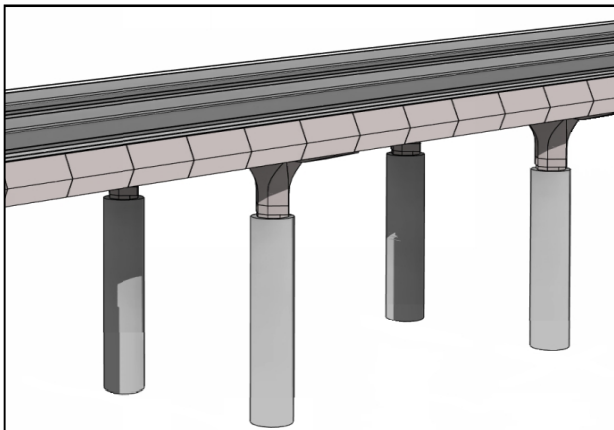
Simply supported, mono-pile bridge structural arrangement (decks not connected).
